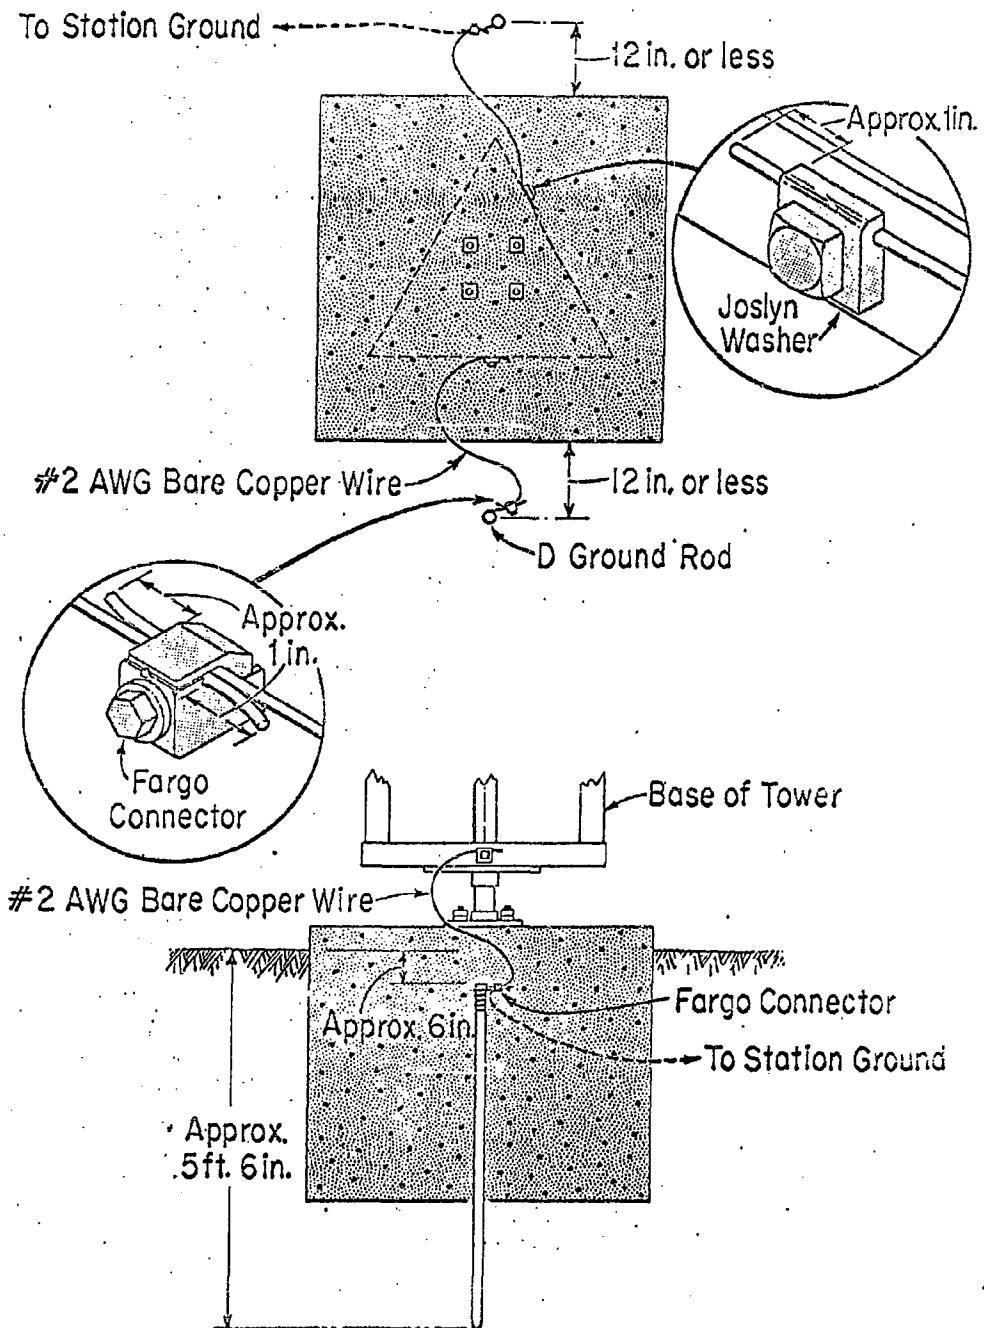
GROUNDING AT FOUNDATION OF GUYED TOWER.
